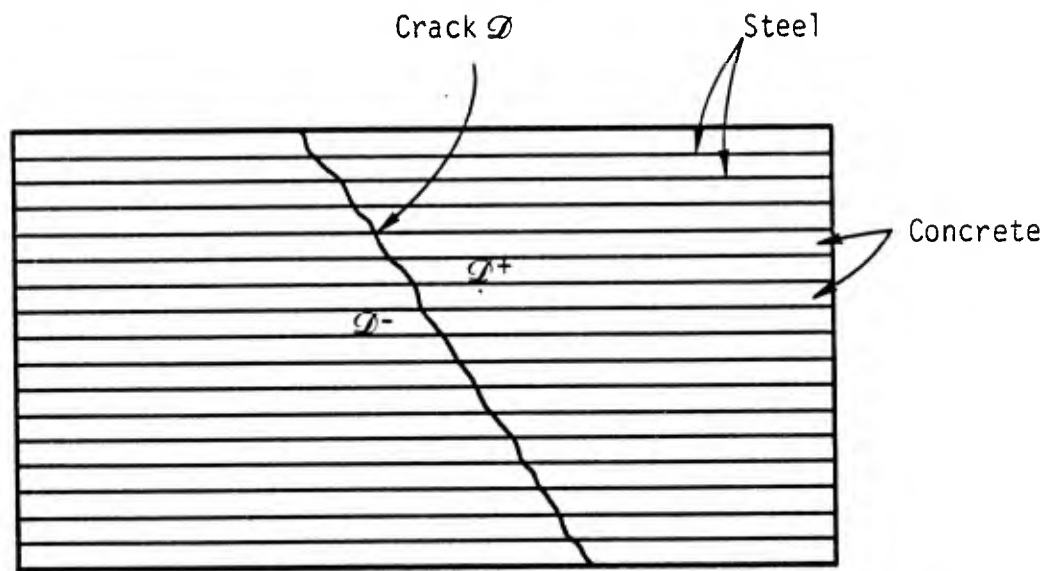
A cracked reinforced concrete with dense steel layout.
